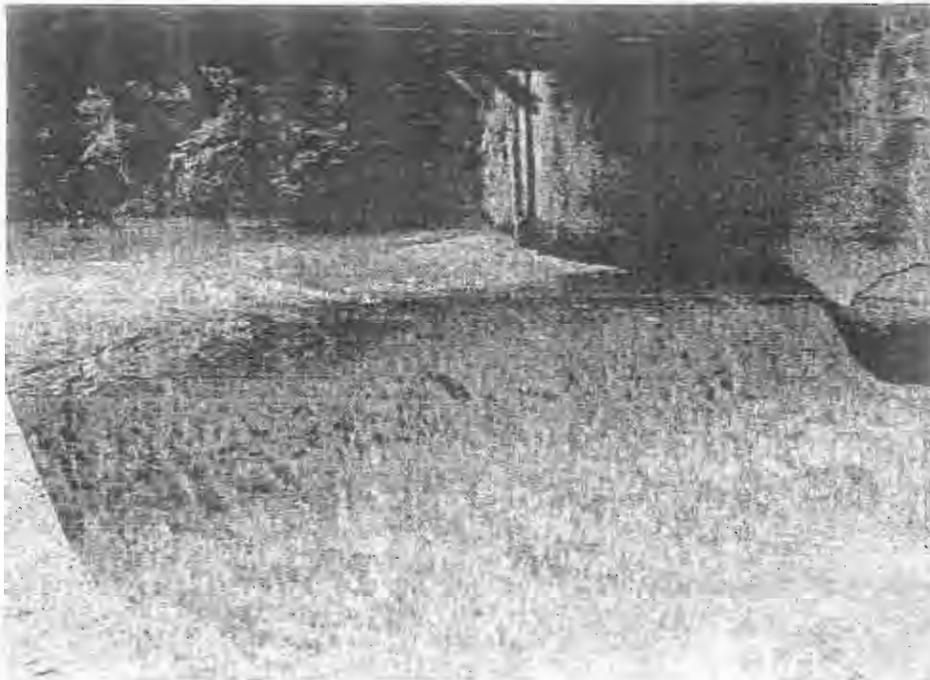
Downstream side of the Coloso dam. Drop during lower flows (photo condition) approximately 2 meters including a lower step not shown in the photo. Note that the vertical sidewalls have a wetted zone.
